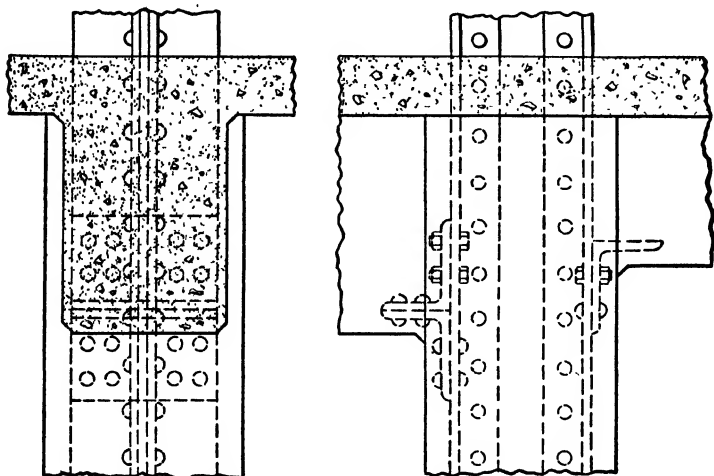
Steel Brackets for Floor Beams. (See p. 442.)
